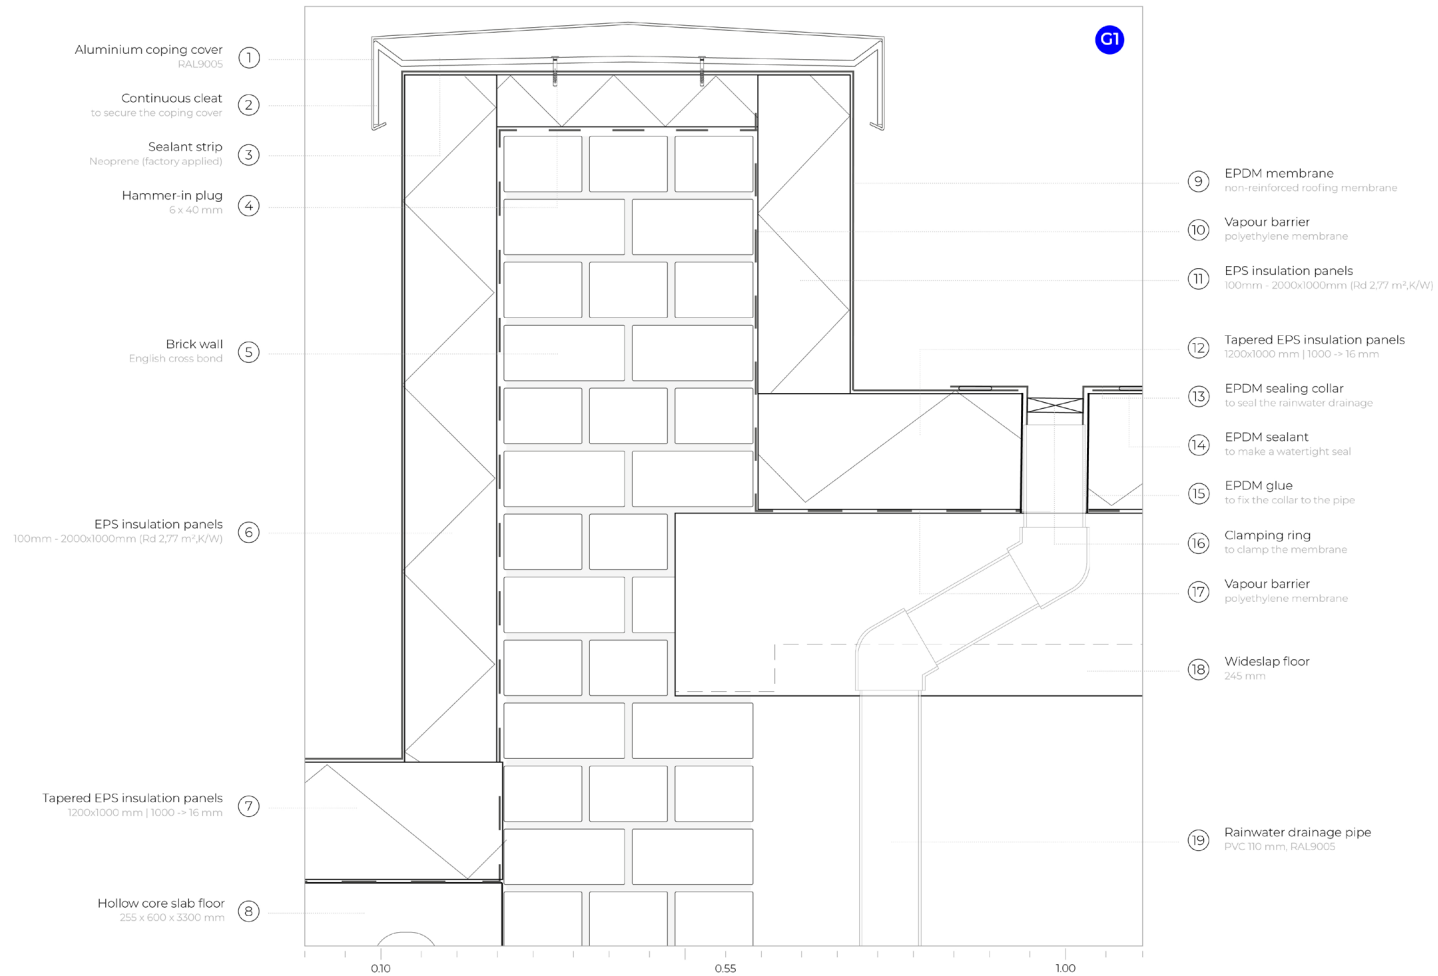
DETAIL DRAWINGS | VERTICAL SECTION F | SCALE 1:10
